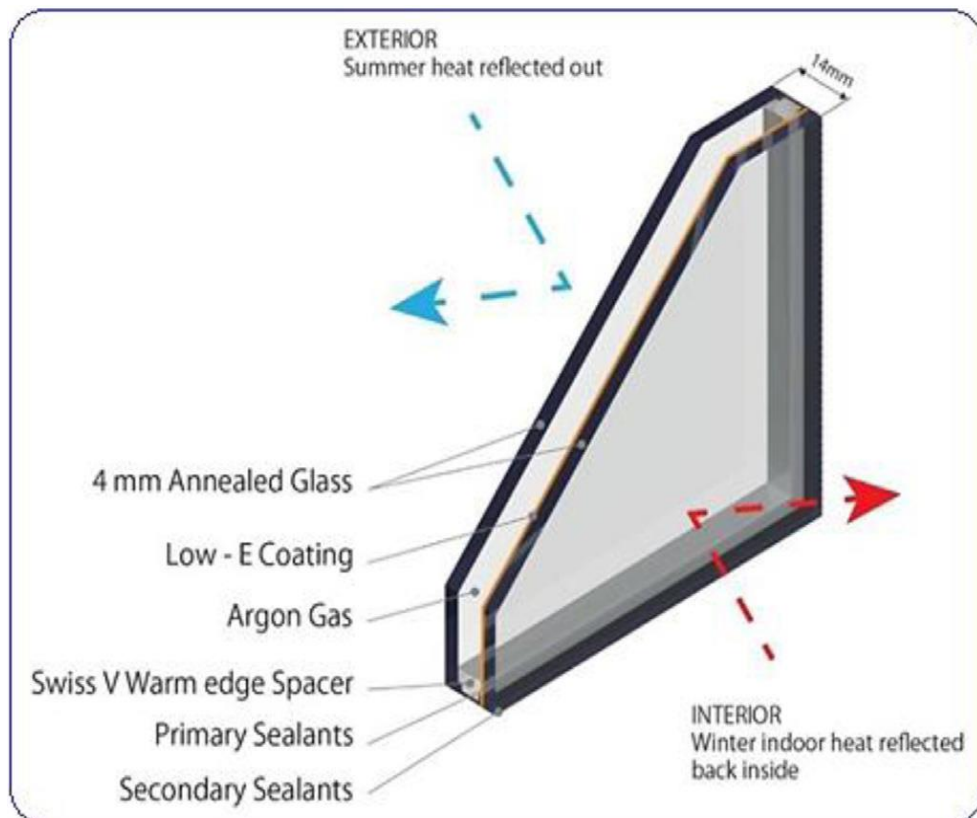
Structural details of conventional argon filled double glazed windows [7] .
